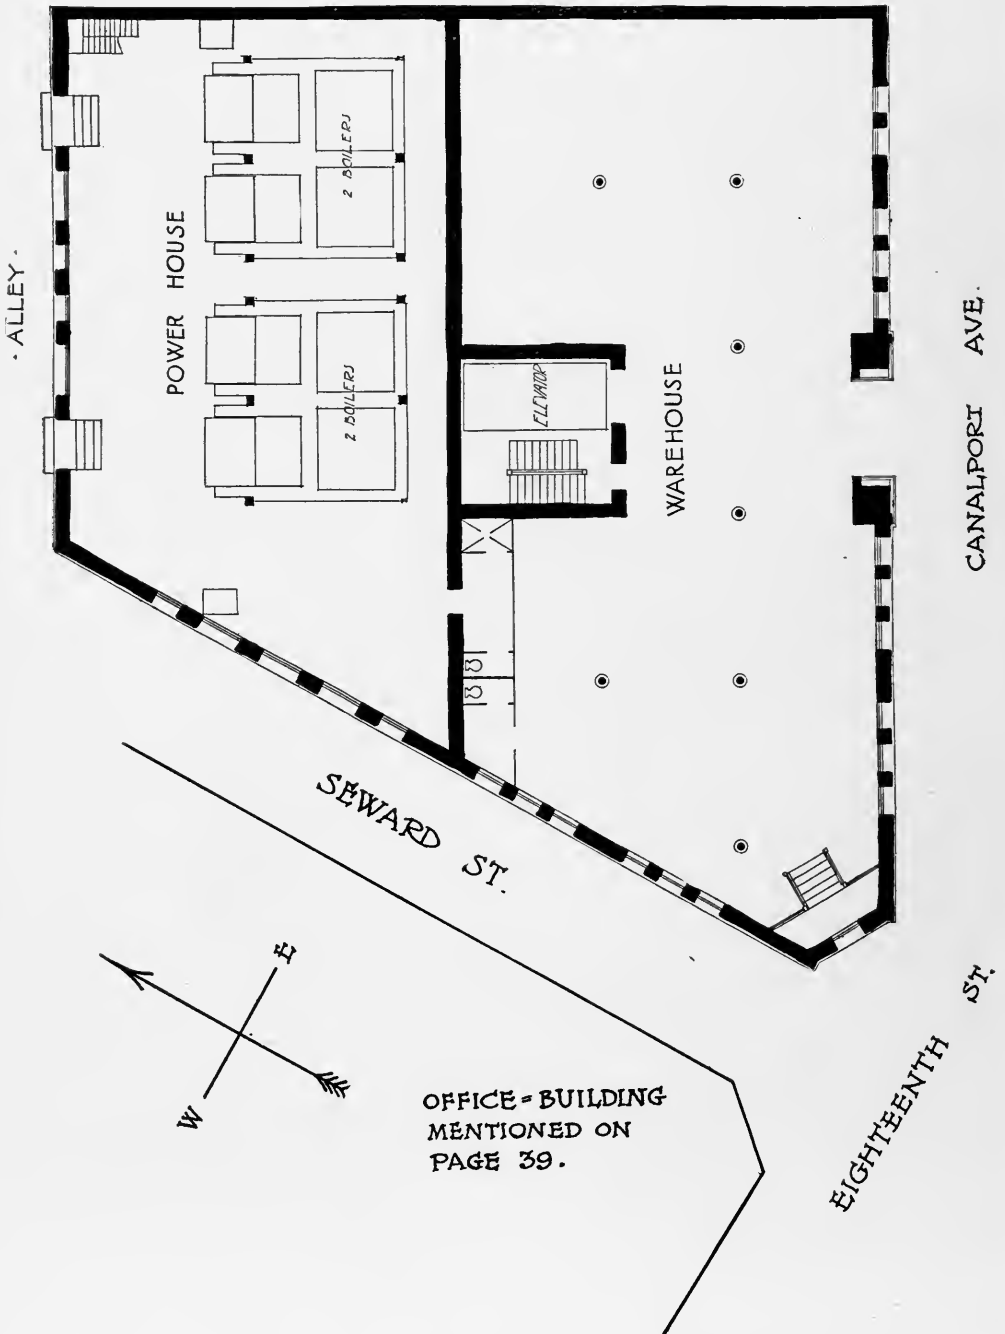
PLAN OF THE SCHOENHOFEN BREWERY.
